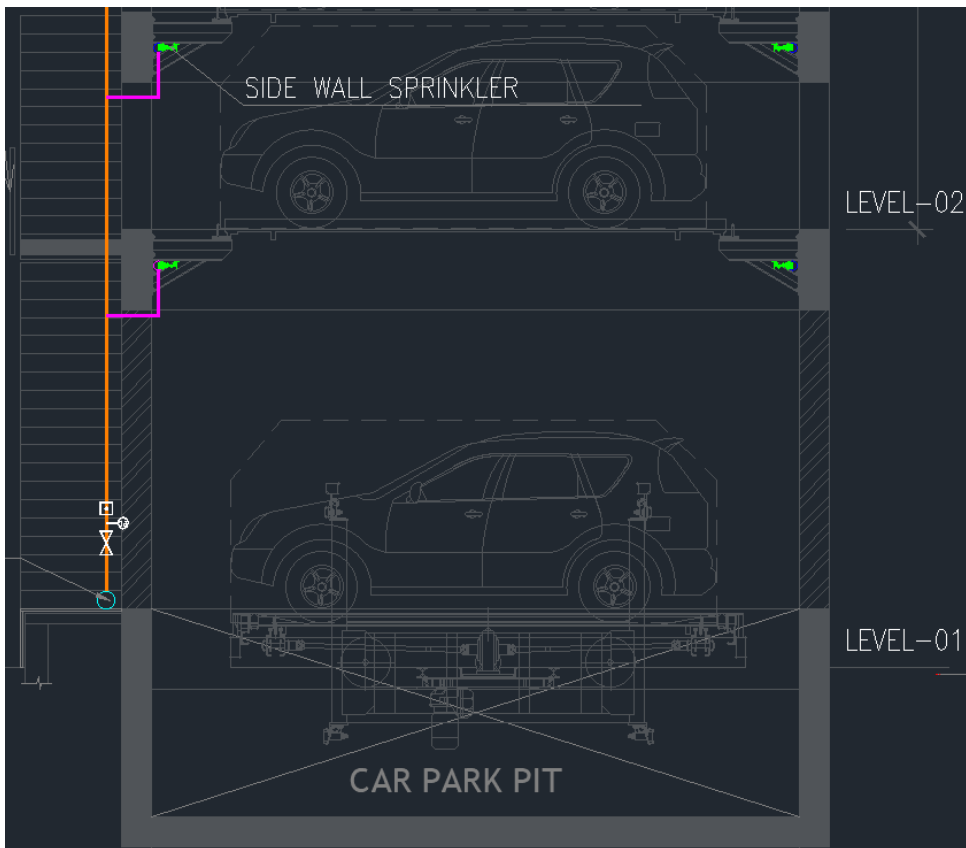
Section layout of side wall sprinkler facing the car bonnet / engine
